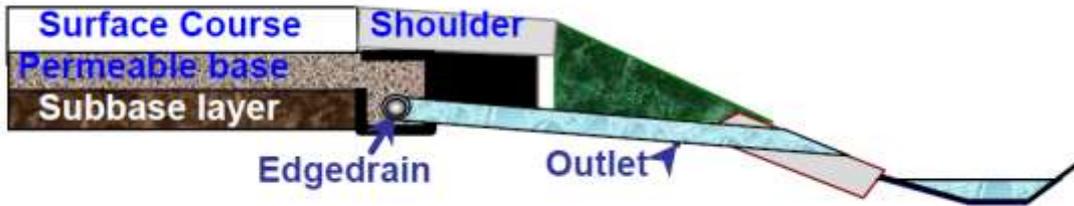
Pavement system with the drainage system (FHWA, 2006)
